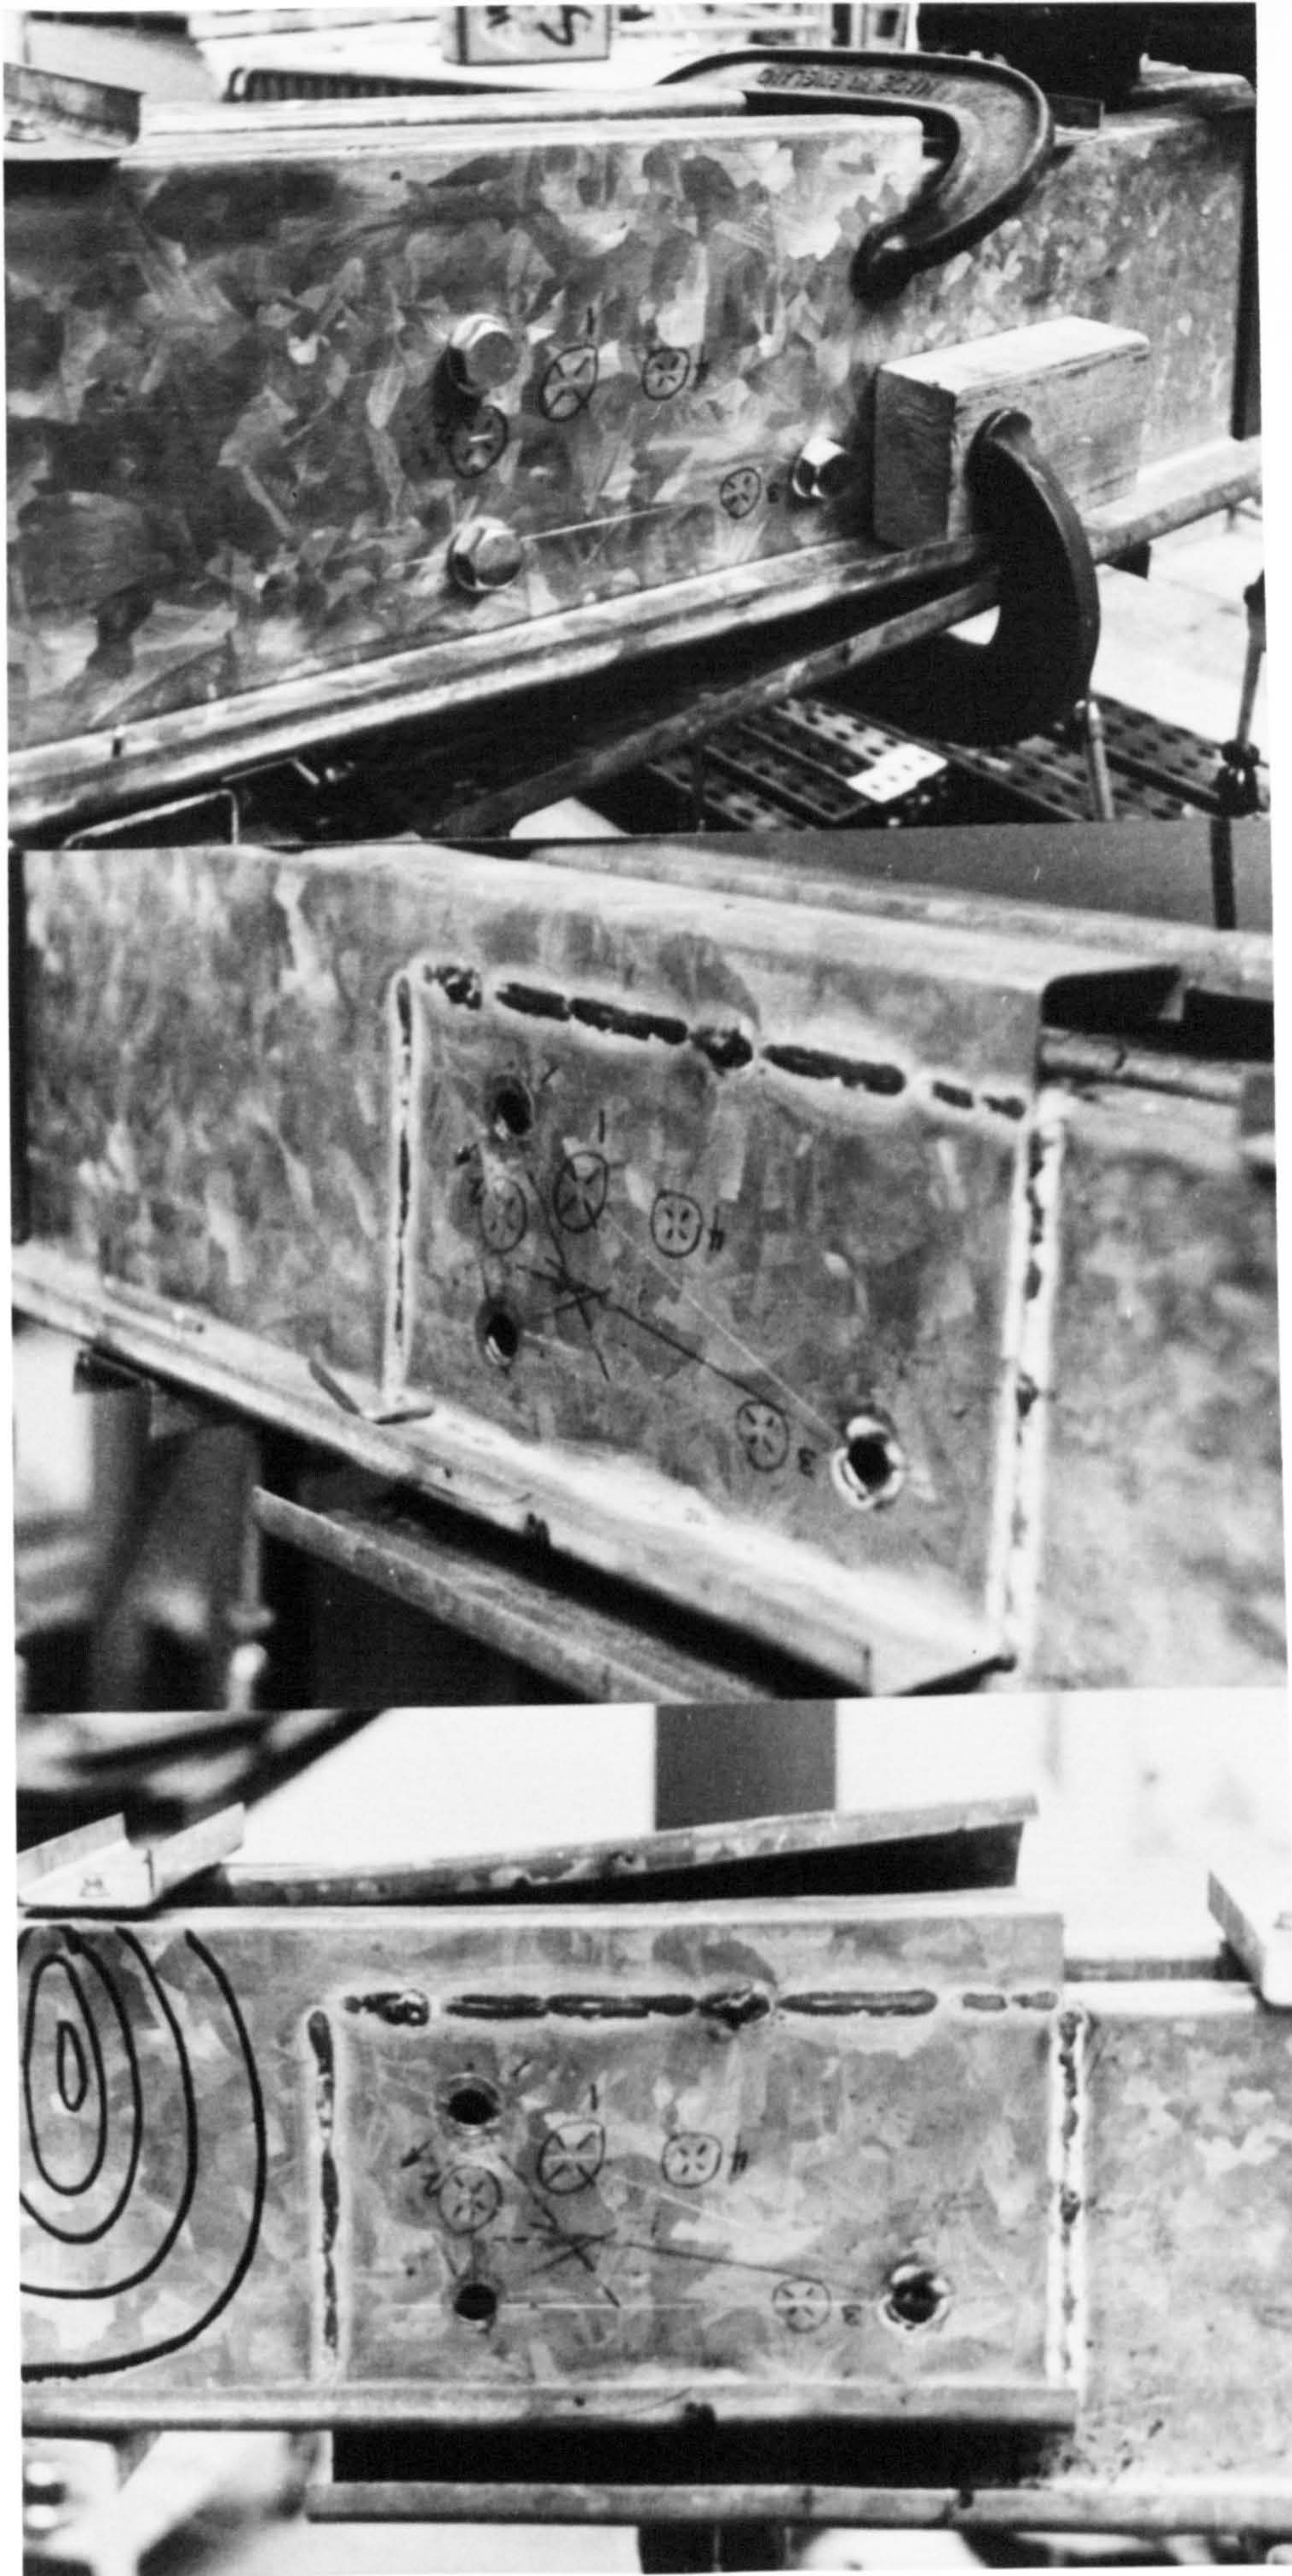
Bolted and welded Zed sections (not nesting) at failure
